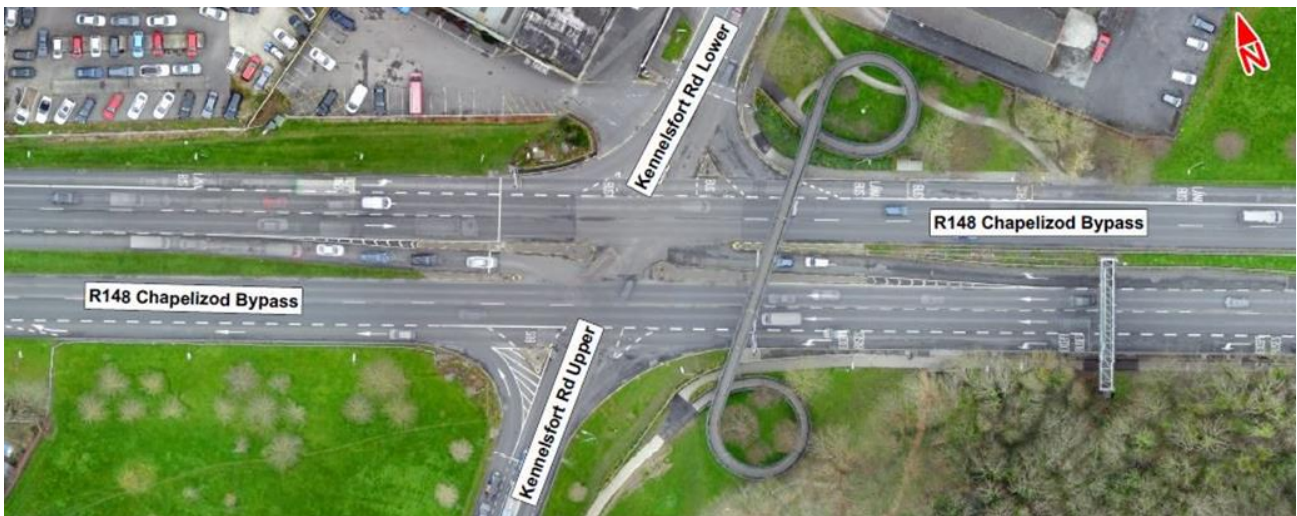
R148 Palmerstown Bypass / Kennelsfort Road Upper and Lower Junction
